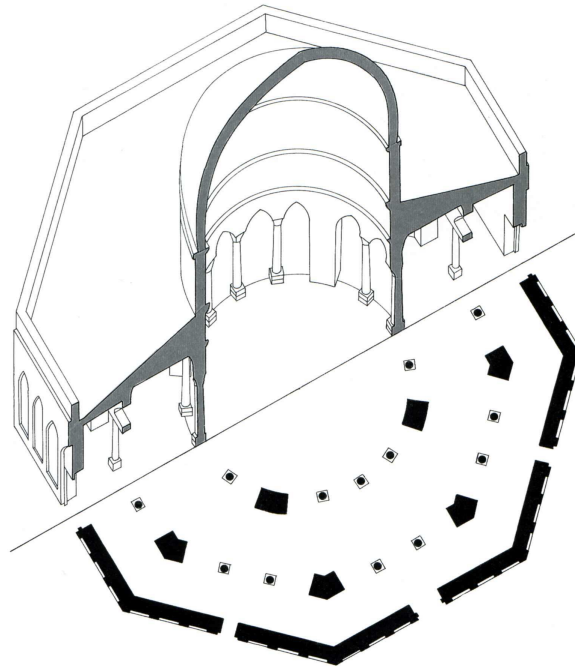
Dome of the Rock: plan, section, and elevation. The porches have been eliminated since their exact shape is not certain.
